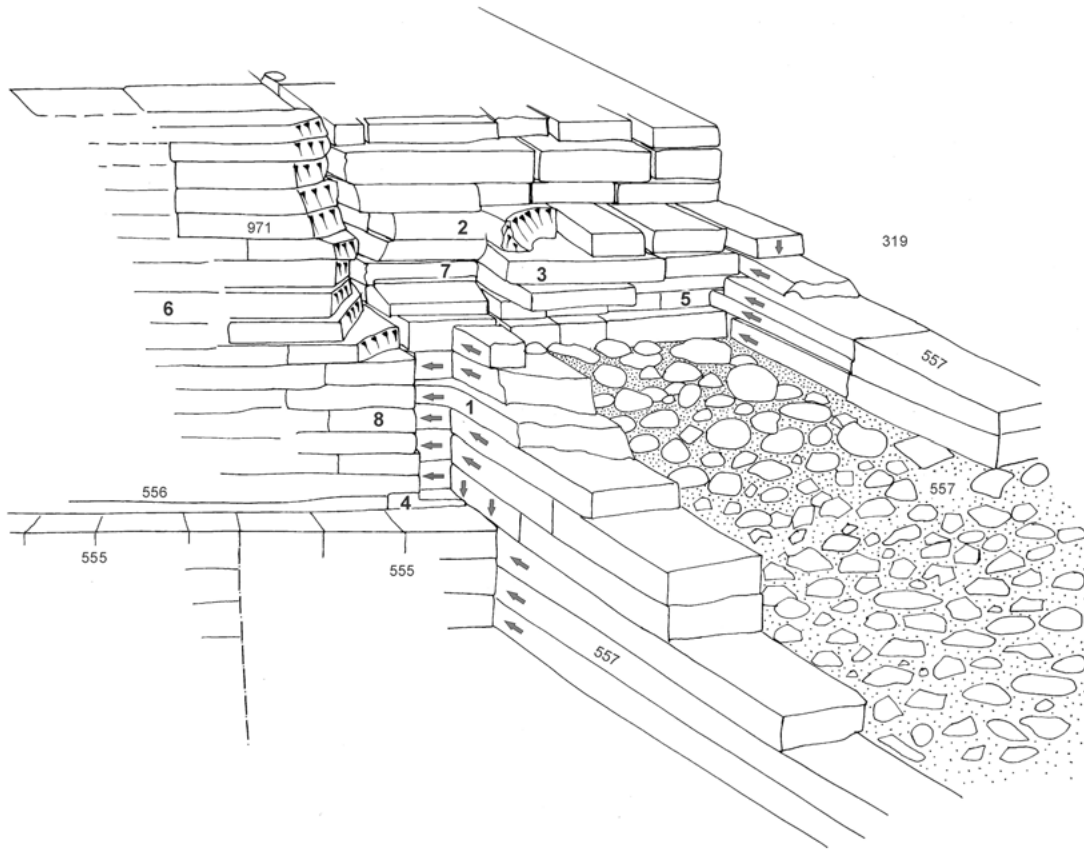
Sketch of the joint between walls 556 and 557 at the southwest corner of the North Temple from the south-west. Arrows indicate where a brick abuts another.
